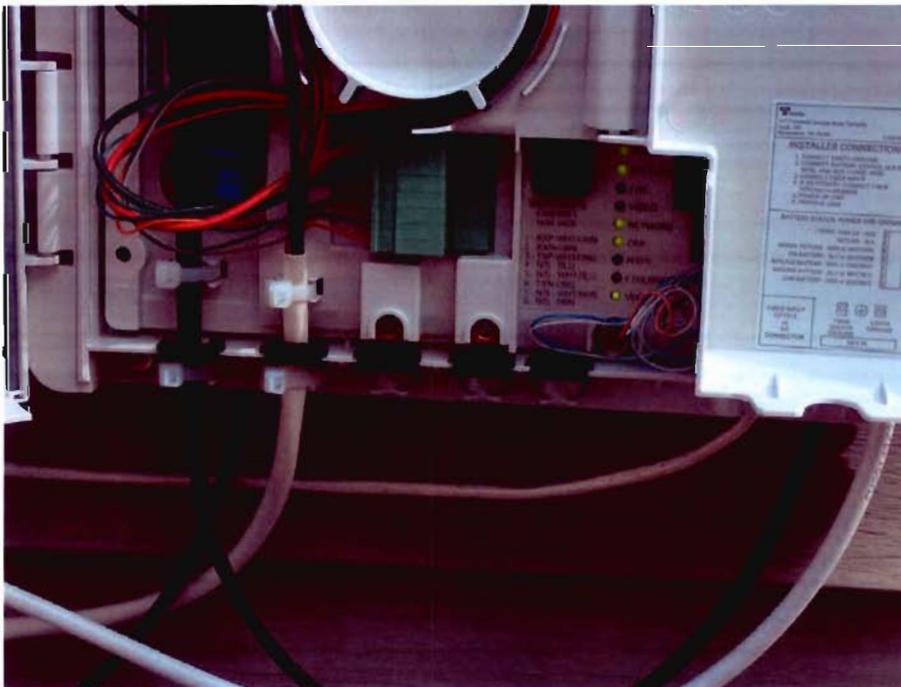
Pole # 25, [REDACTED] Laurel Hollow Road.
